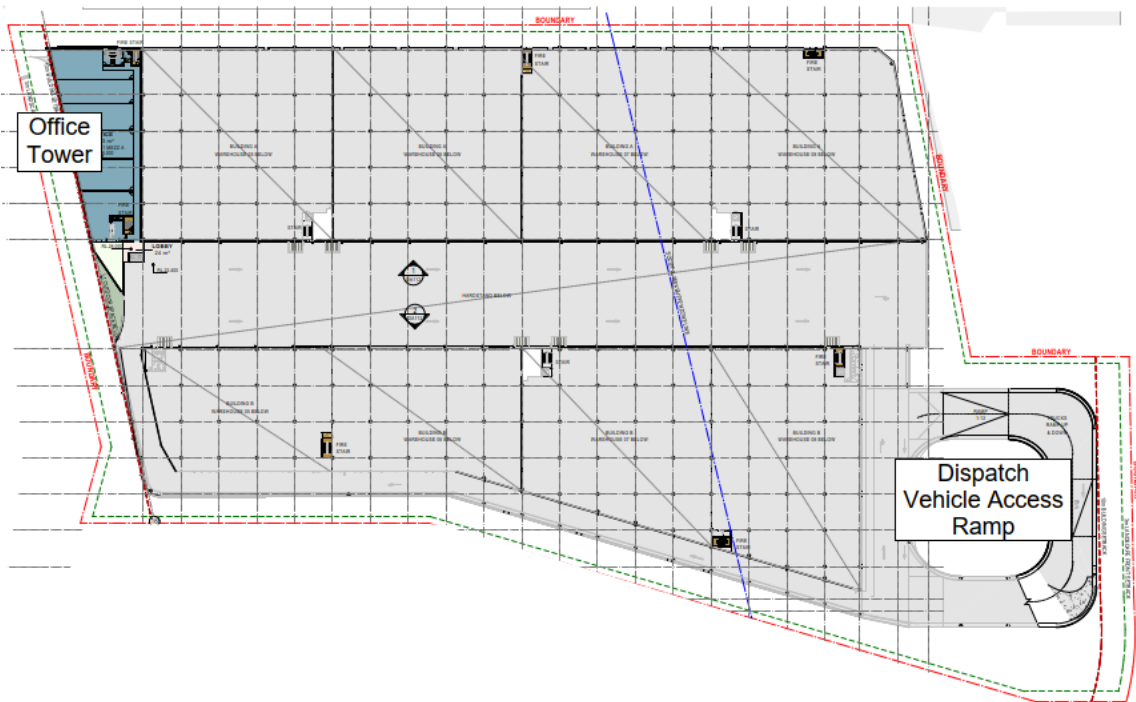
Level 1 Mezzanine (Office) Floor Plan
